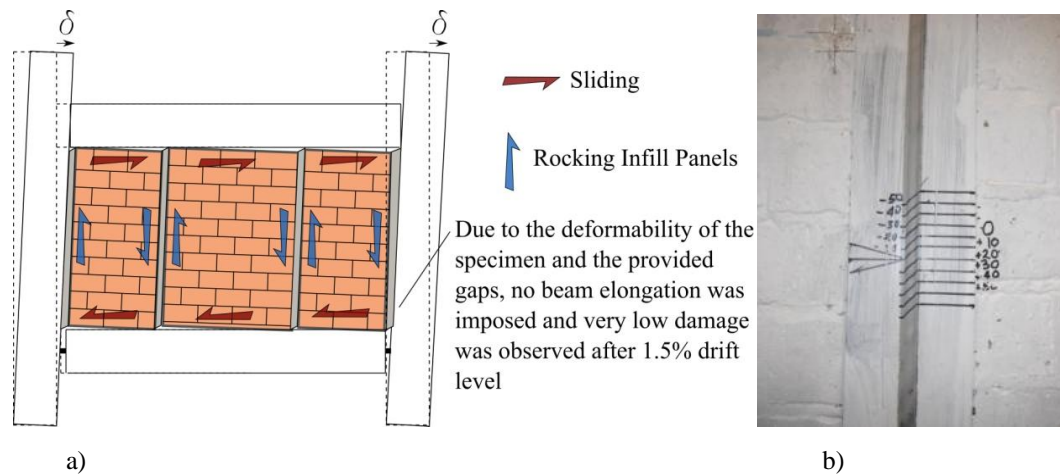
Damage photos of low damage unreinforced clay brick infill wall specimen MIF5-UCBI at the end of the test
